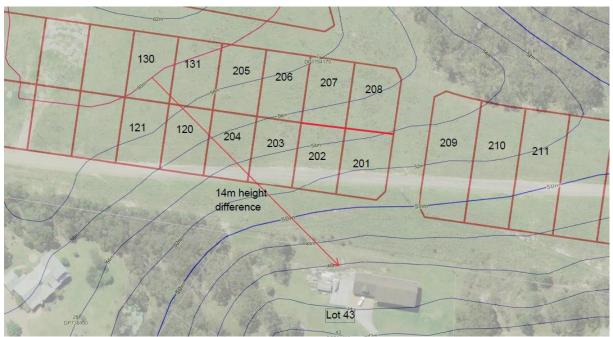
Example of potential impacts of site design and topography on adjoining properties
